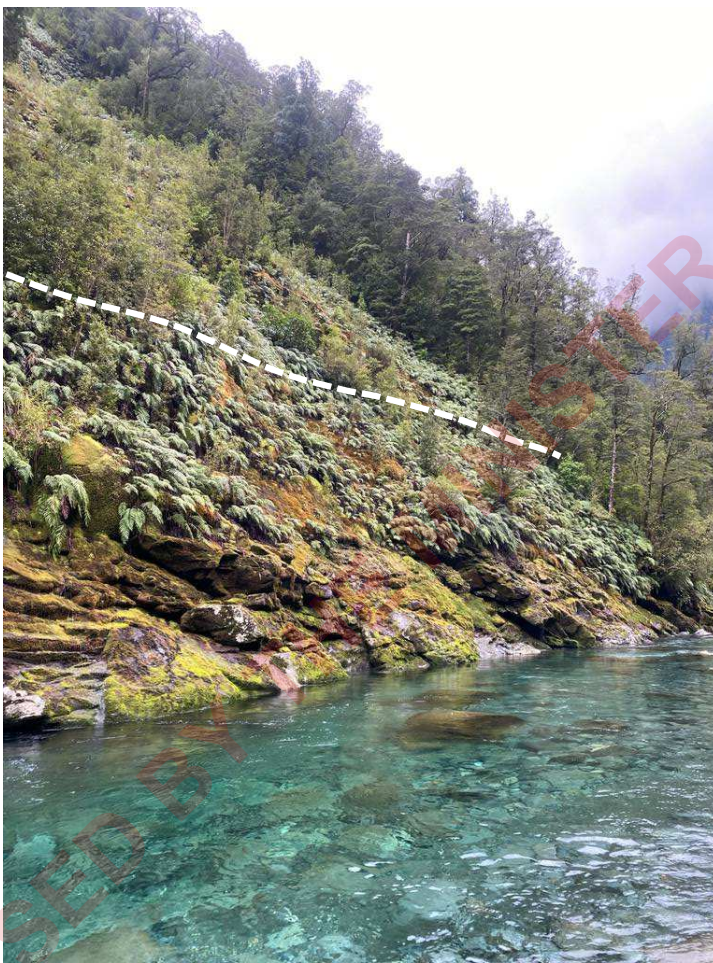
Rock face adjoining Cleddau River, site of Bluff Bridge
